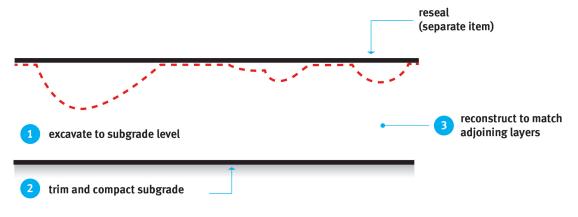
Reconstruct road unbound granular pavement. Excludes seal.
